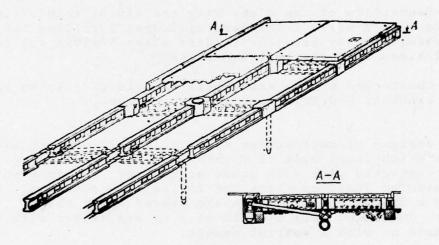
shows the designs of prefabricated pavements from slabs of the system of A.V. Yakovlev under heavy load (30 t on the axis) for temporary roads on weak soil. The slabs are laid down on a prefabricated, reinforced concrete framework consisting of frameworks and crosspieces.
